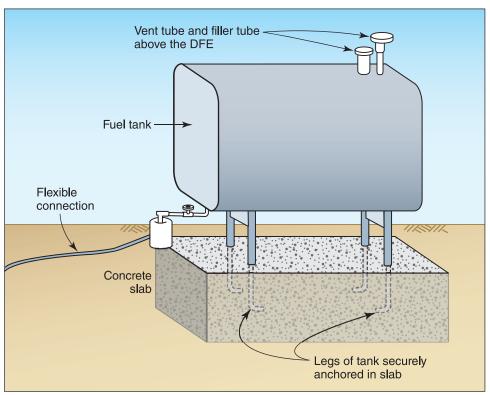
Anchoring a fuel storage tank with a concrete slab.
